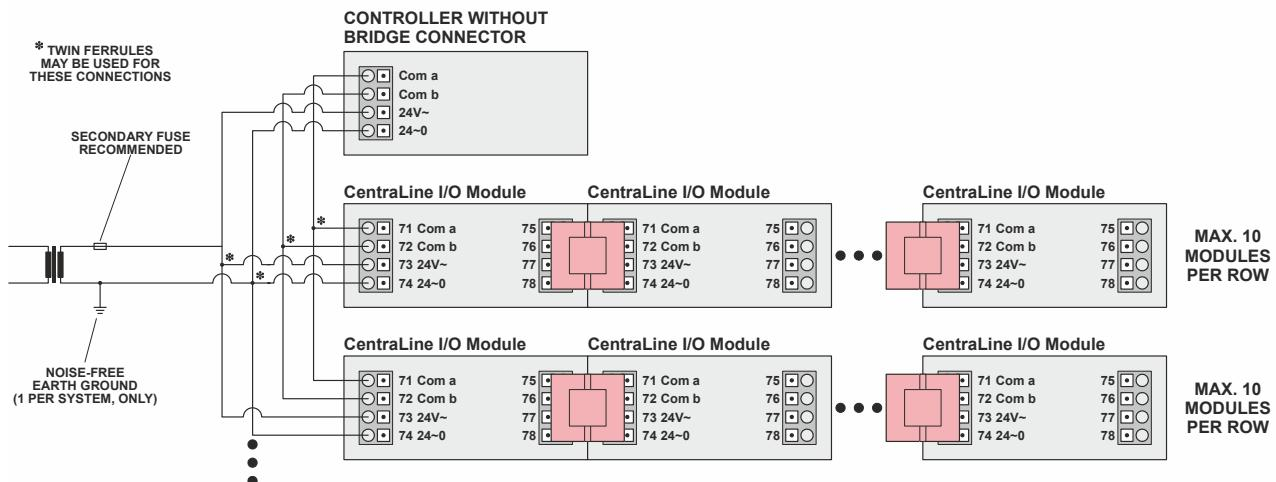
Wiring controllers not supporting bridge connectors (for fusing, see section "Fusing Specifications" on page 9)
